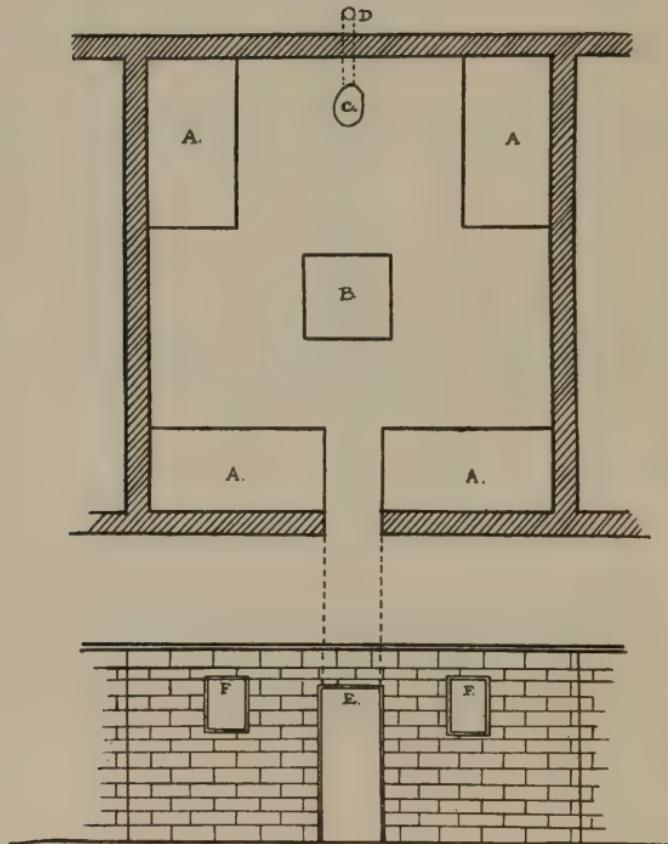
Section of improvised barracks. Front elevation. *A*, Bunks; *B*, table; *C*, stove; *D*, chimney; *E*, door; *F*, windows. Scale $\frac{1}{8}'' = 1'$. (*Lake*)
